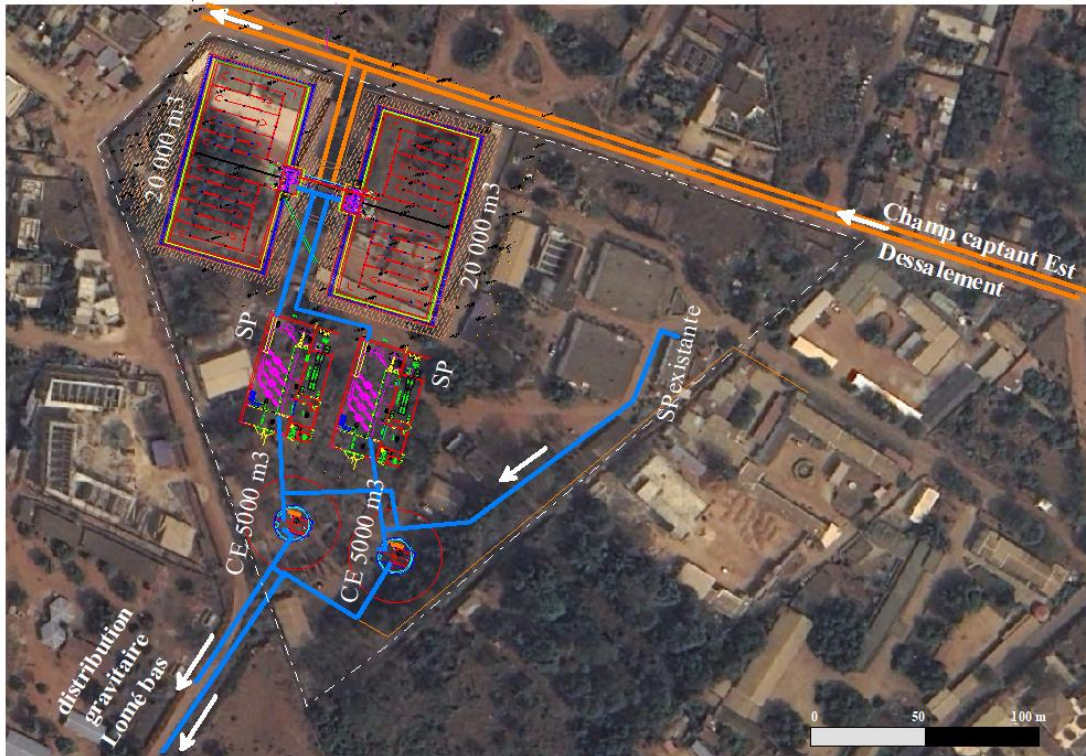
Planned installations - Stadium site (~45,000 m2)
